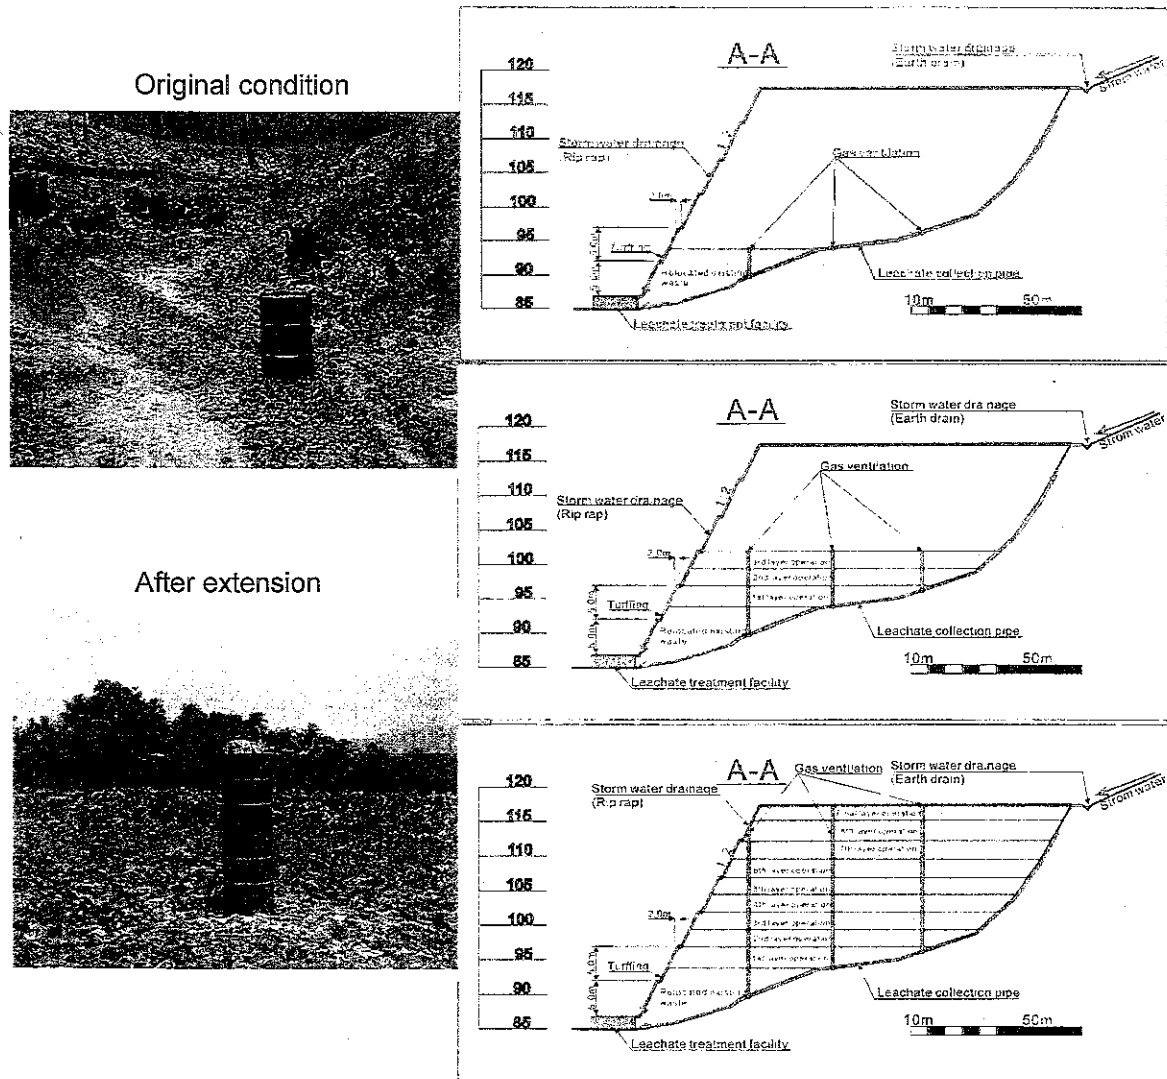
Extension of Gas Ventilation Facility (Vertical)
